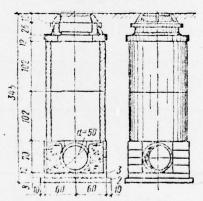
Pre-fab reinforced concrete inspection well: a - cross section; b - general view; l - hydroisolator; 2 - sand pad; 3 - concrete pad.
